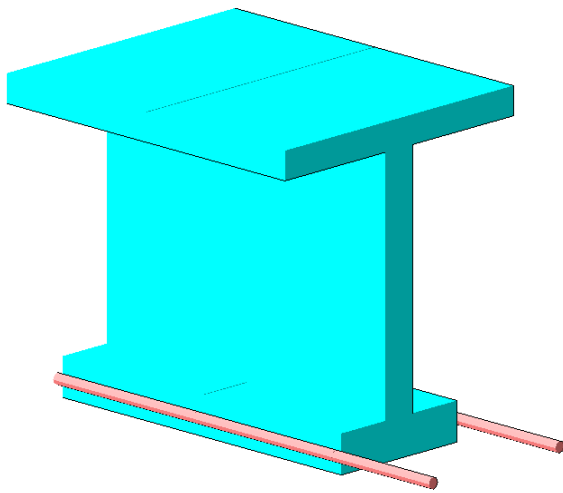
Calculation model of the cross-section of a typical span beam (Type 56) reinforced with two conventional reinforcement bars
